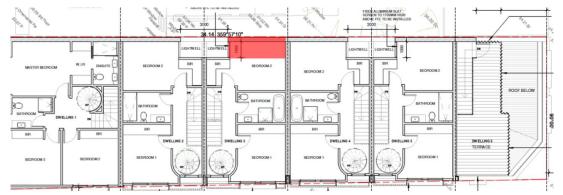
Proposed reduction to Bedroom 2 of Dwelling 3 shown in red
